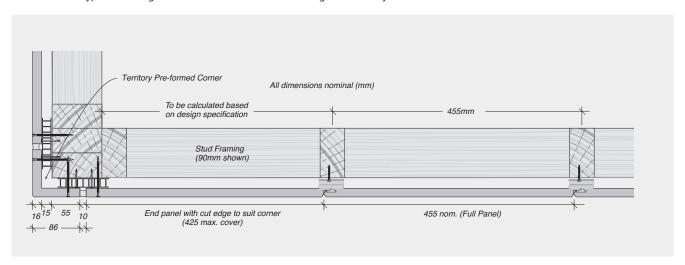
Typical Framing Set-Out with 70mm Timber Framing and Territory Pre-formed Corners – Plan View
